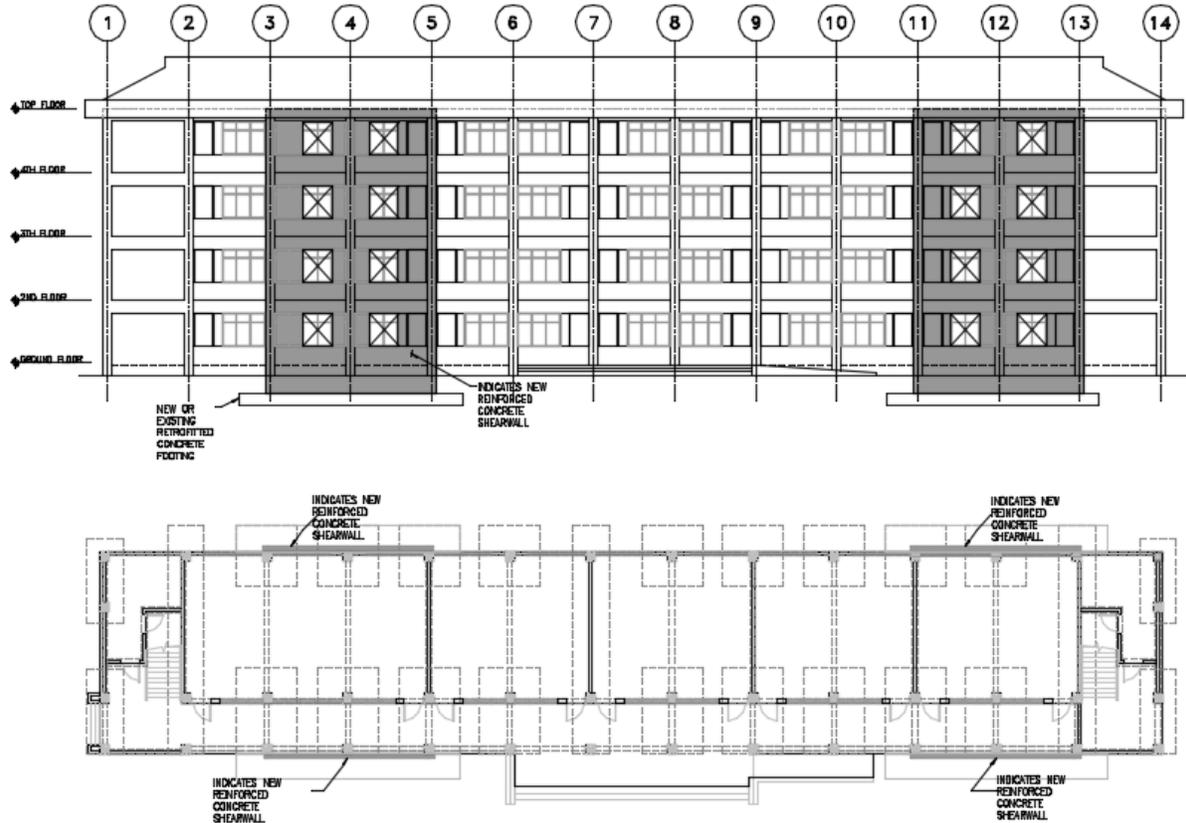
Seismic retrofitting by addition of concrete shear walls
